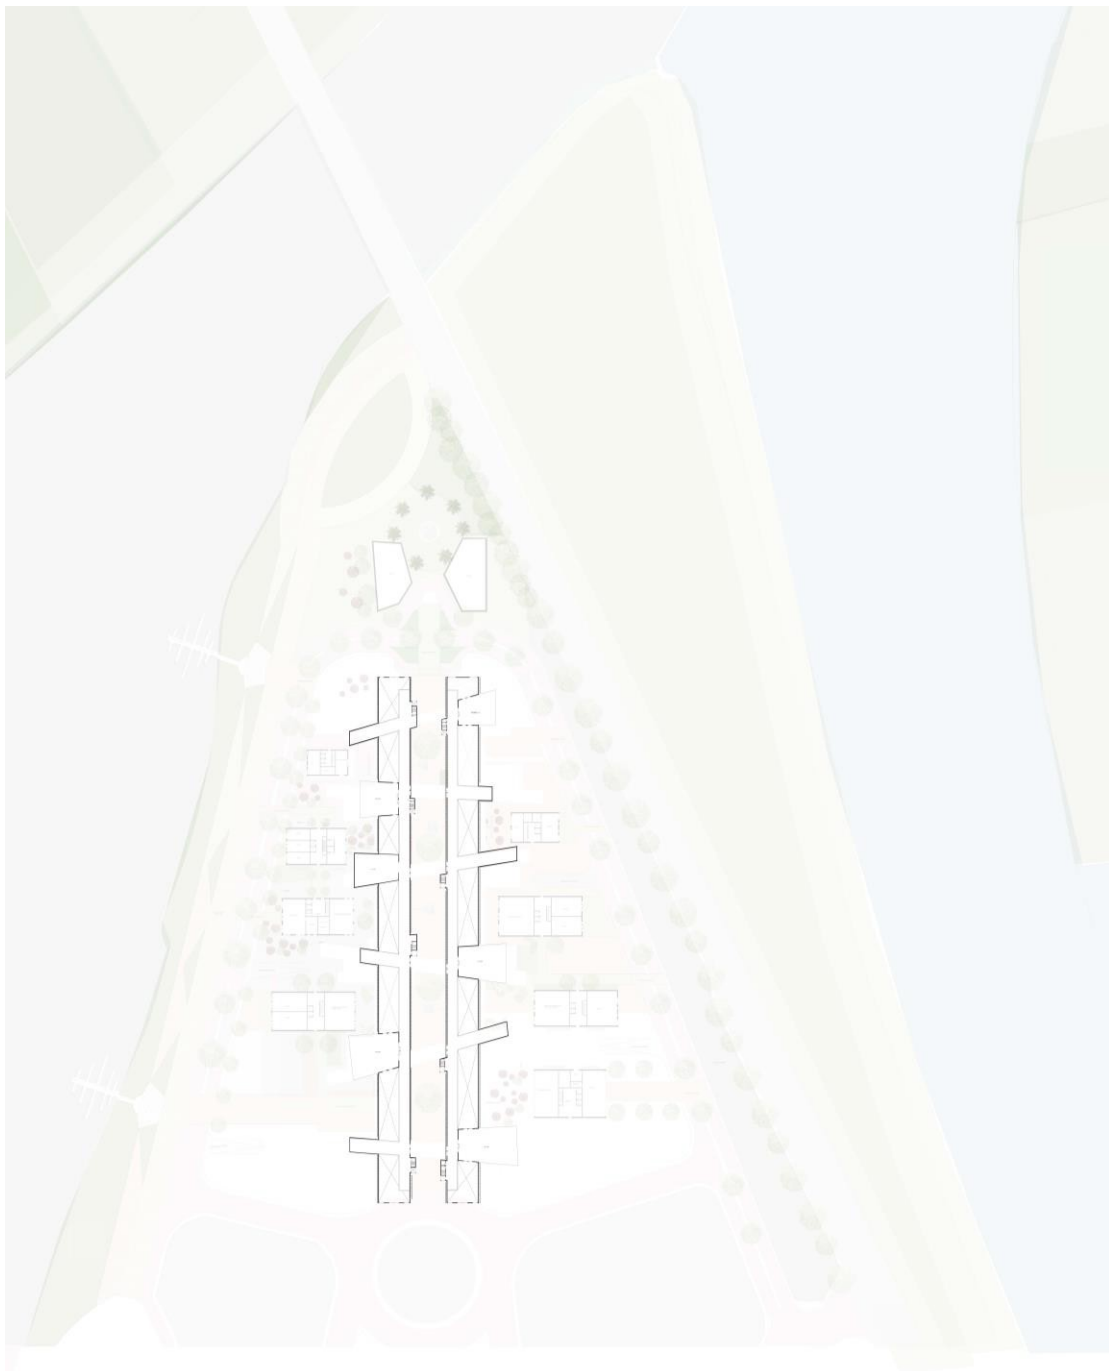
Detailed spatial configuration of the pavilions, residential ground floor and courtyard spaces
